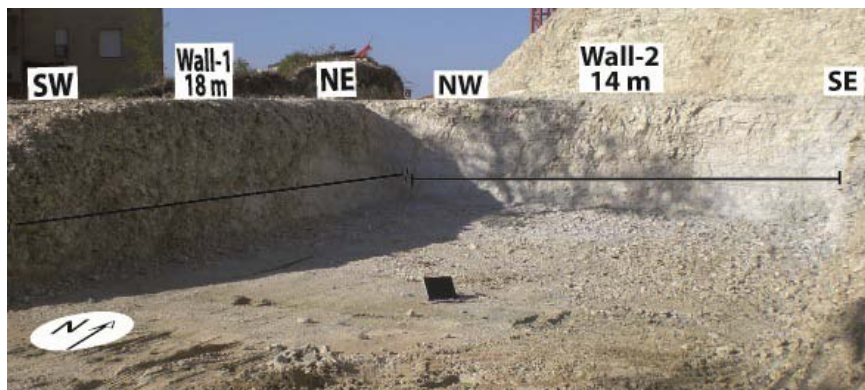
Photograph of site 7. The studied area is located in the Cingoli town within an artificial excavation for house buildings. The site is characterized by two walls: Wall 1 is SW-NE oriented (18 m-long); Wall 2 is NW-SE (14 m-long).
